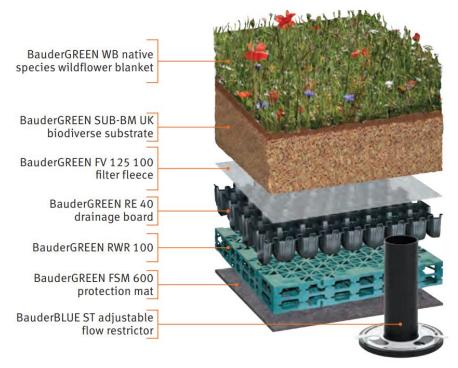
Bauder Green/Blue Roof System Section (Source: Bauder Blue Roof Design Guide)
